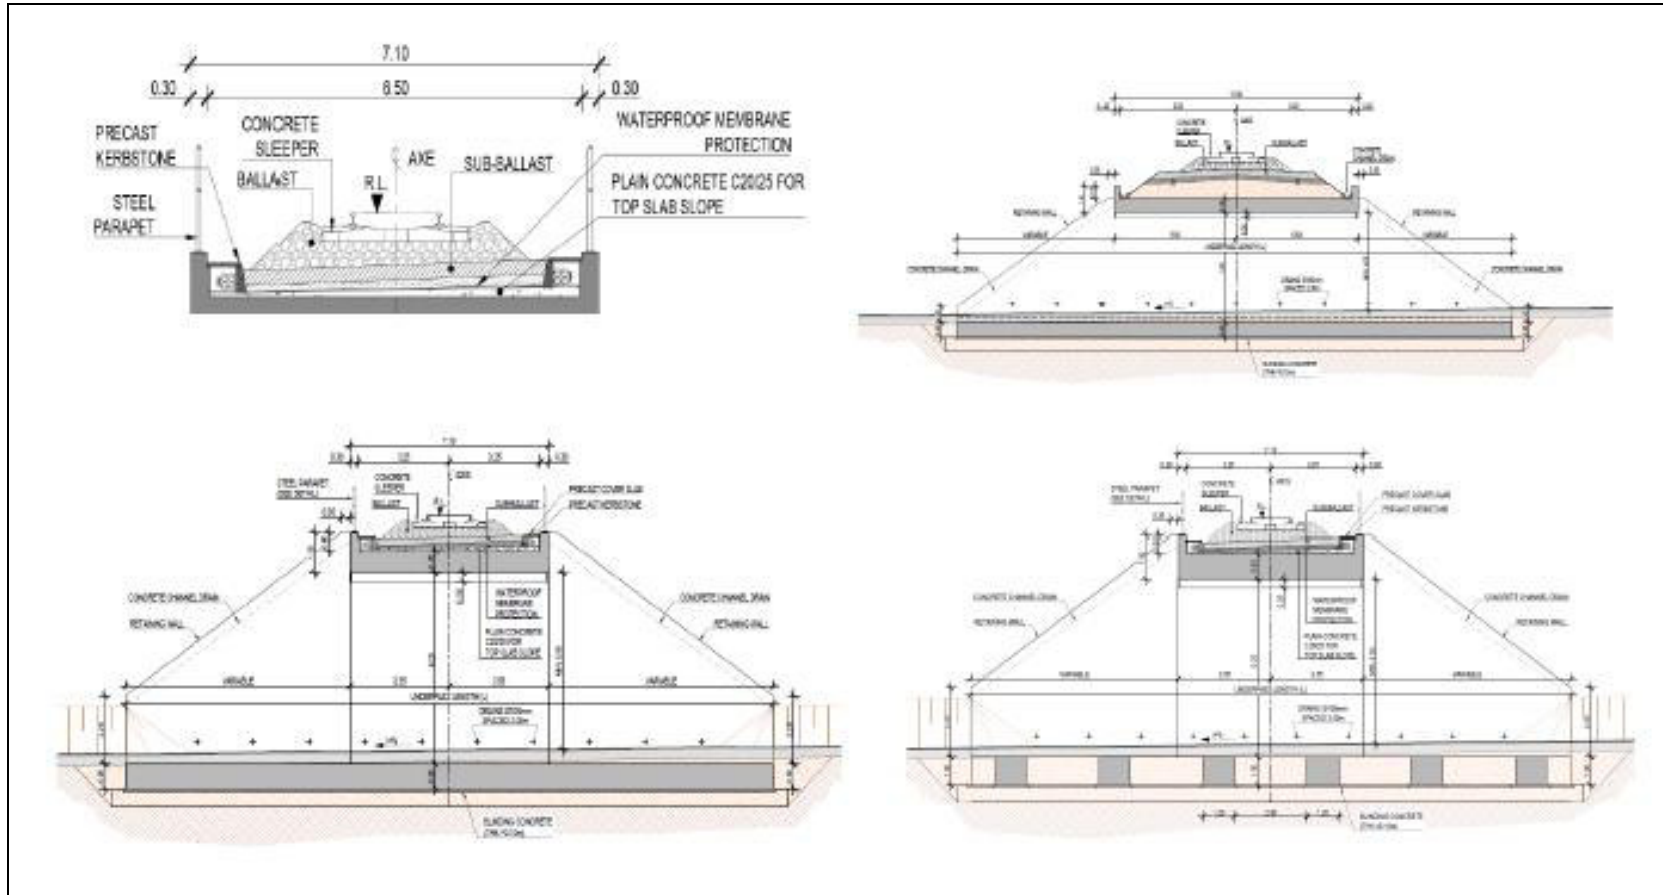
10: Typical cross section of a road underpass (a), Typical Transversal Profile of an underpass bridge with a width of 5 m or 6 m (b), Typical Transversal Profile of an underpass bridge with a width of 7.5 m (c), Typical Longitudinal Profile of an underpass
